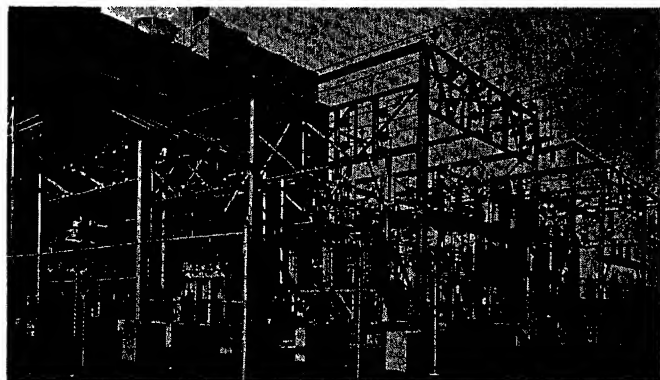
OUTDOOR SWITCHING STATION AT BURLINGTON GENERATING STATION
